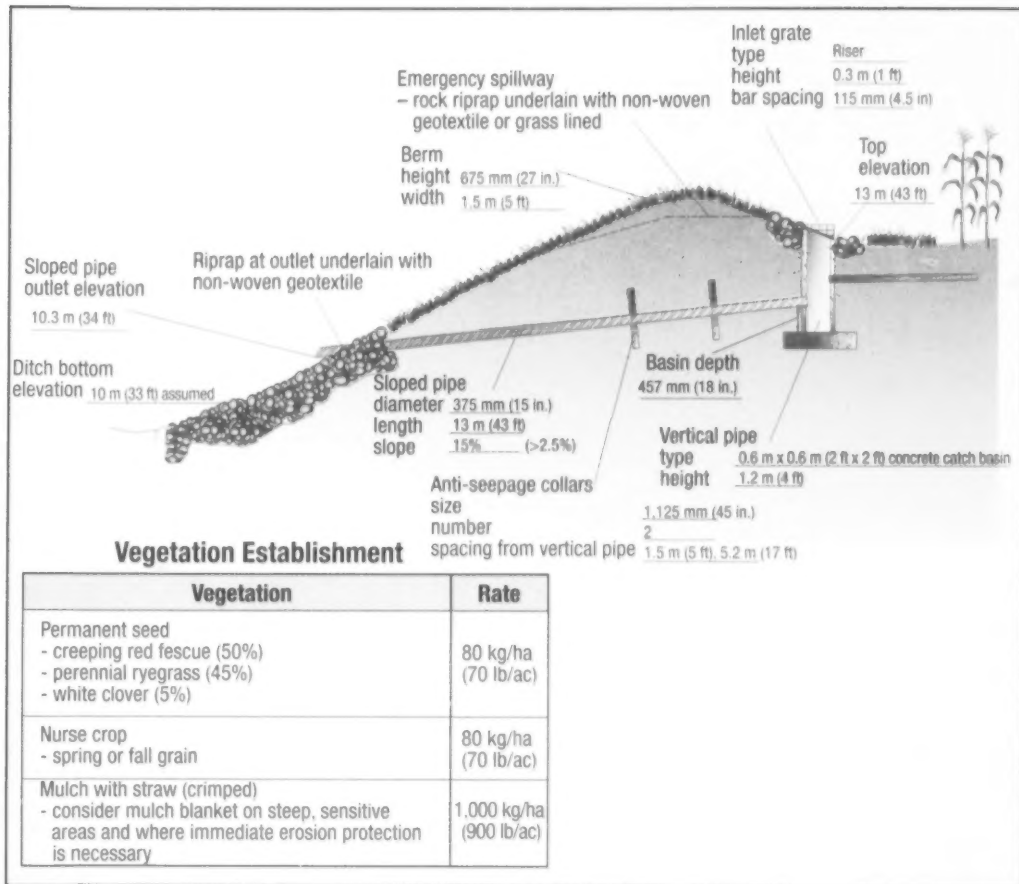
Sloped Pipe Structure – Example Problem #2
